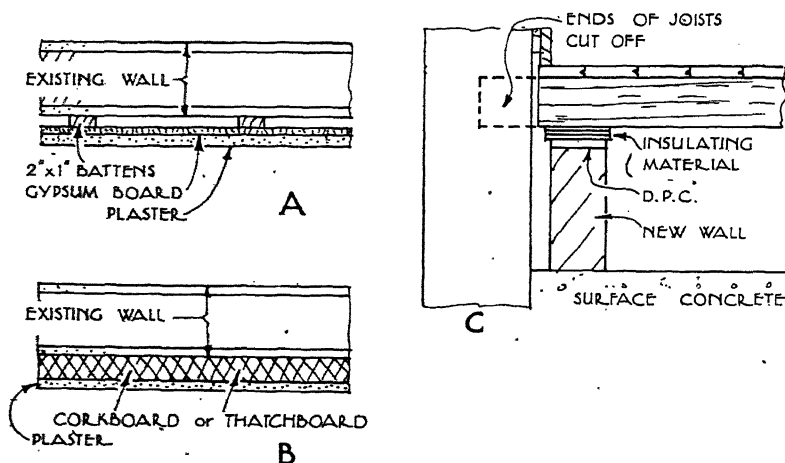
(a and b) INSULATION MATERIAL ADDED TO WALLS. (c) INSULATING FLOOR JOISTS FROM WALL
